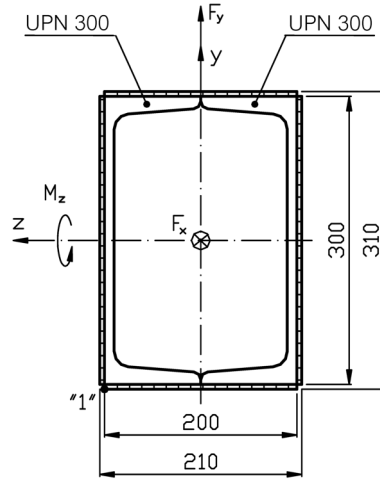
Welded joint between the horizontal girder and the leg of the temporary support
